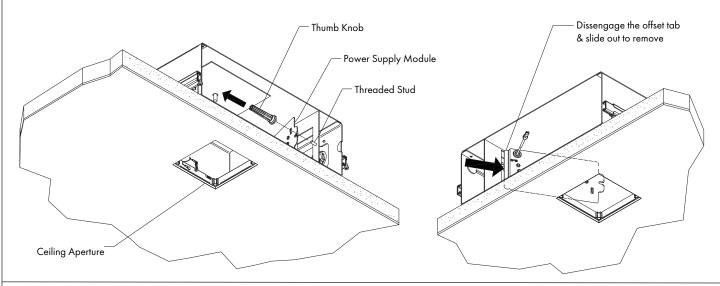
Remove Thumb Knob & Disengage Power Supply Module (Model 804 shown)
